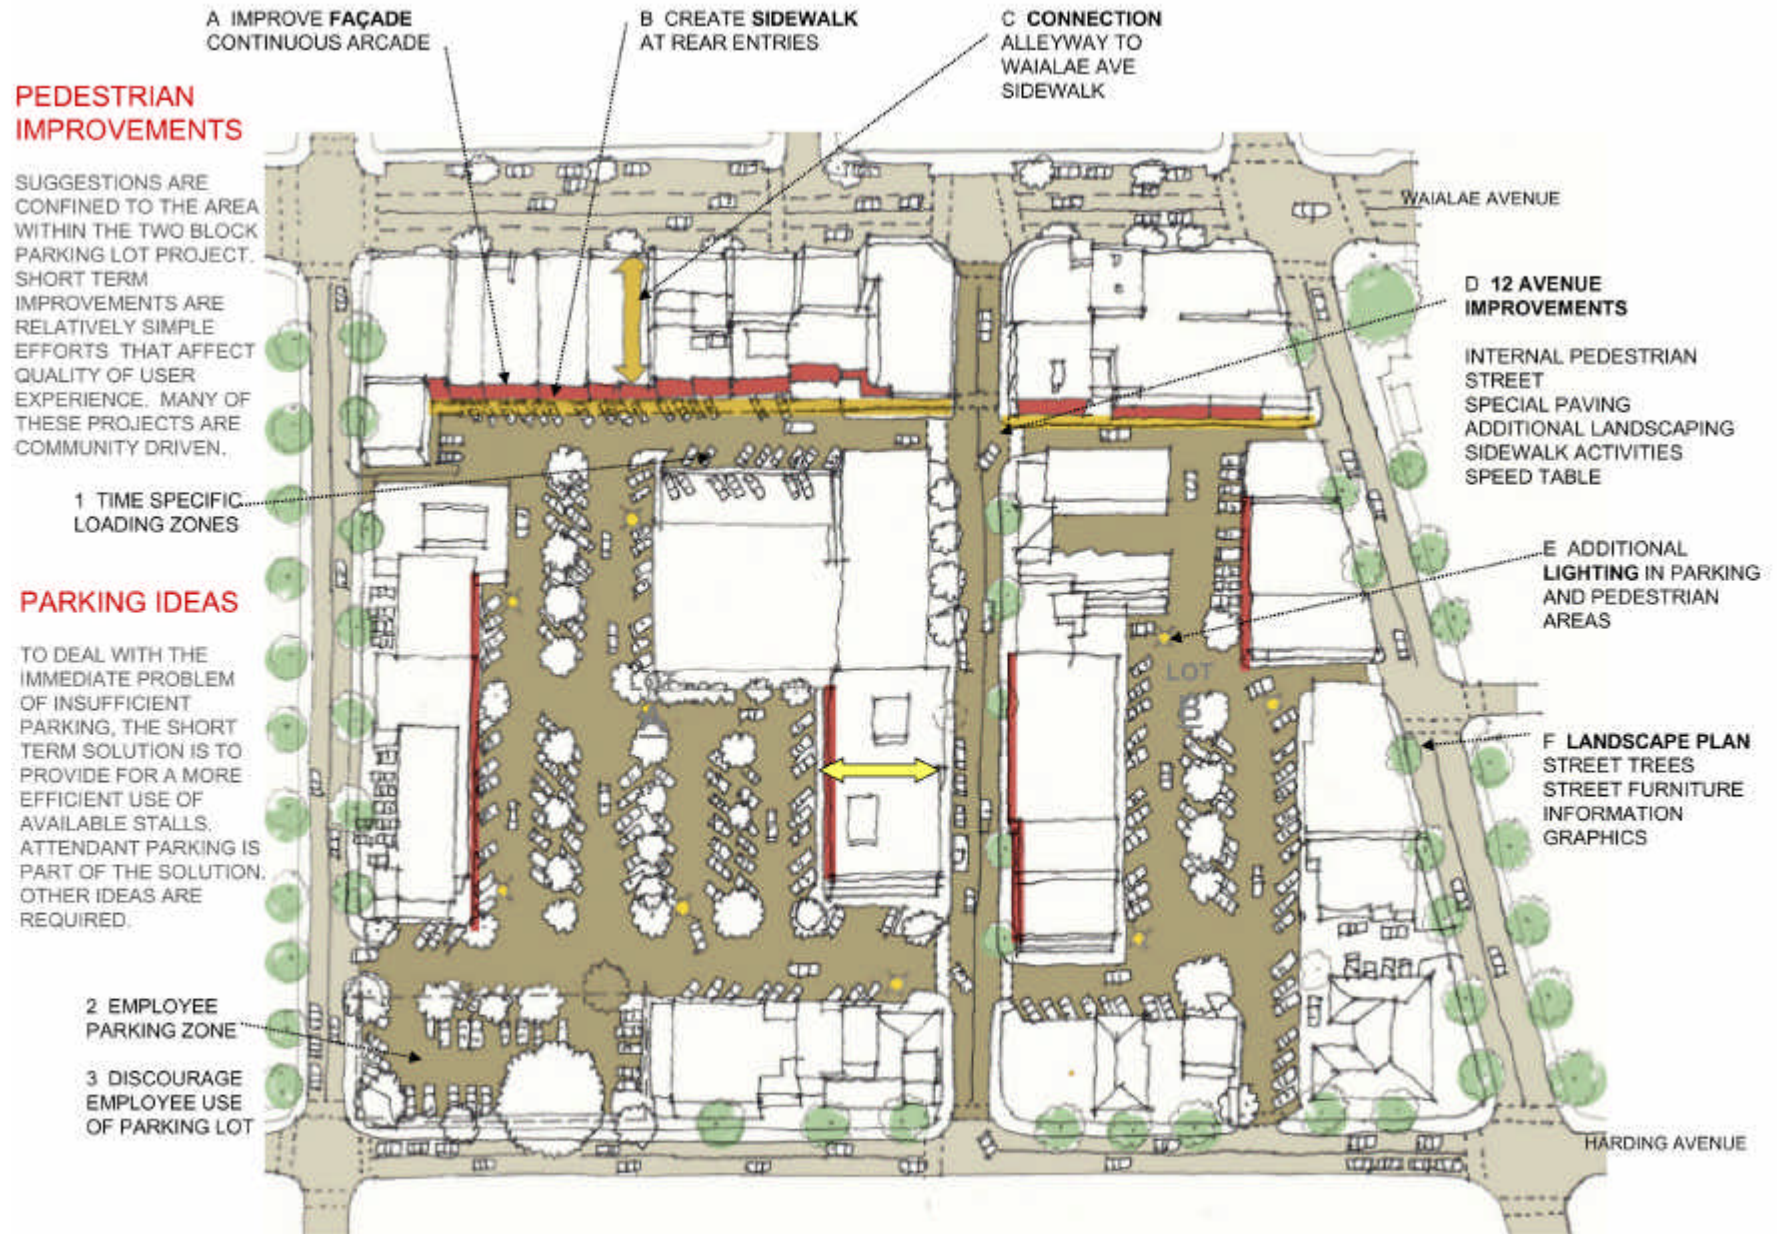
Early Conceptual Site Plan documenting possible short-term improvements
